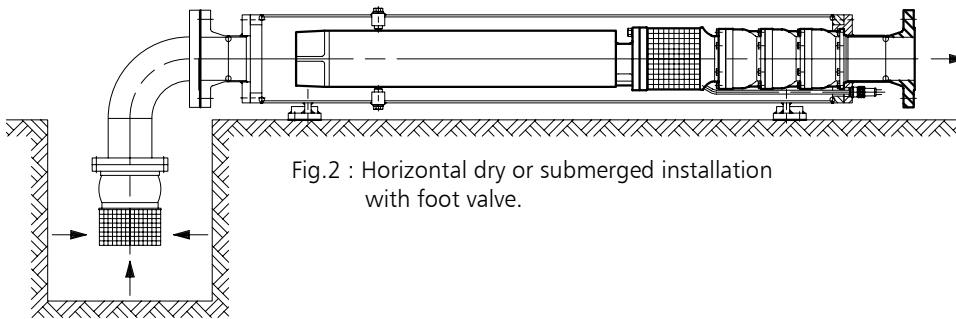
Horizontal dry or submerged installation with foot valve.
